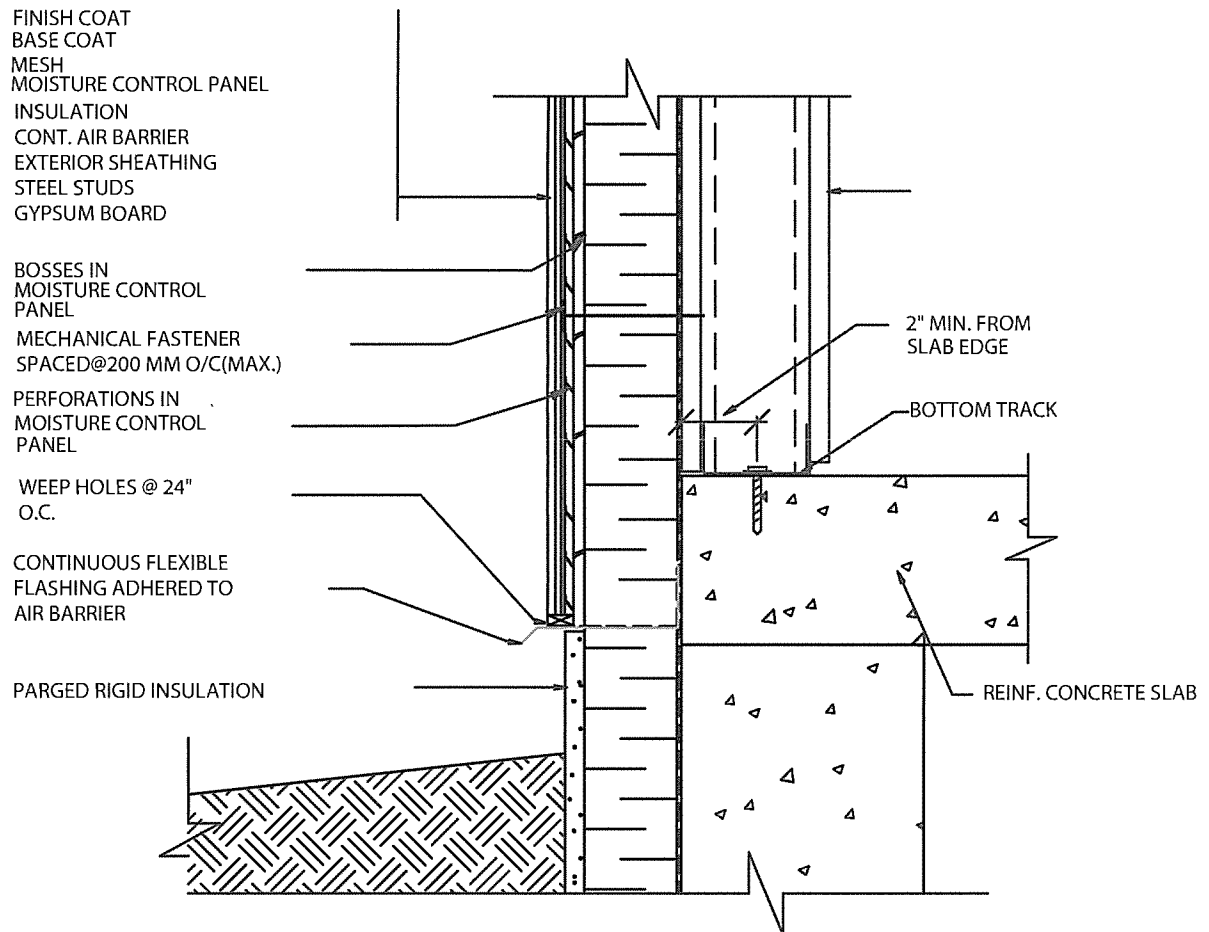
ACRYLIC STUCCO / STEEL STUD - O.W.S.J.
